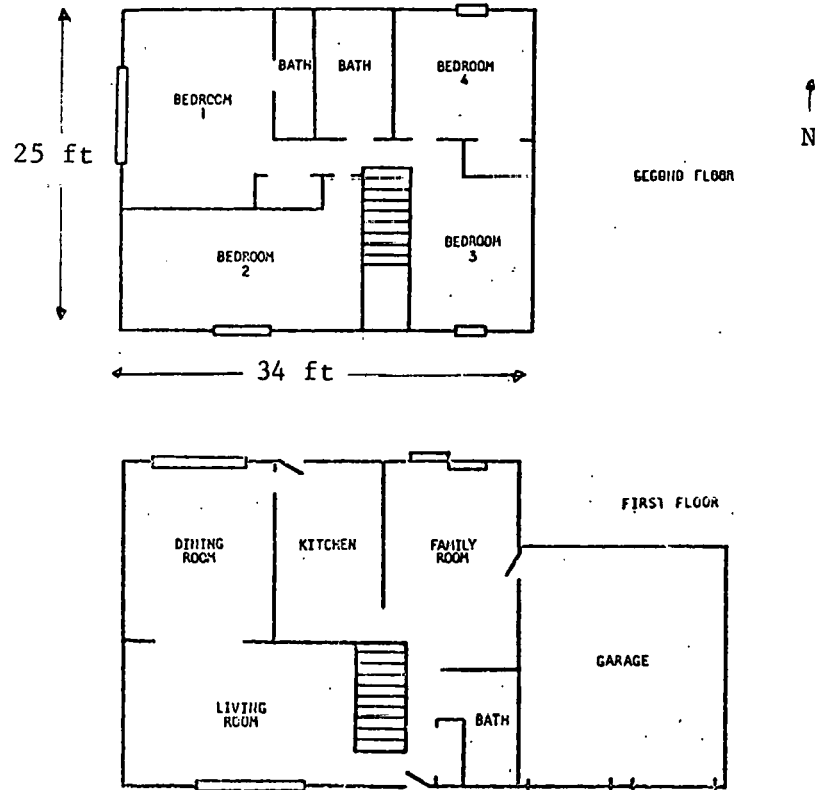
FLOOR PLAN FOR THE CHARACTERISTIC SINGLE-FAMILY, 4-BEDROOM, 2-STORY HOUSE
